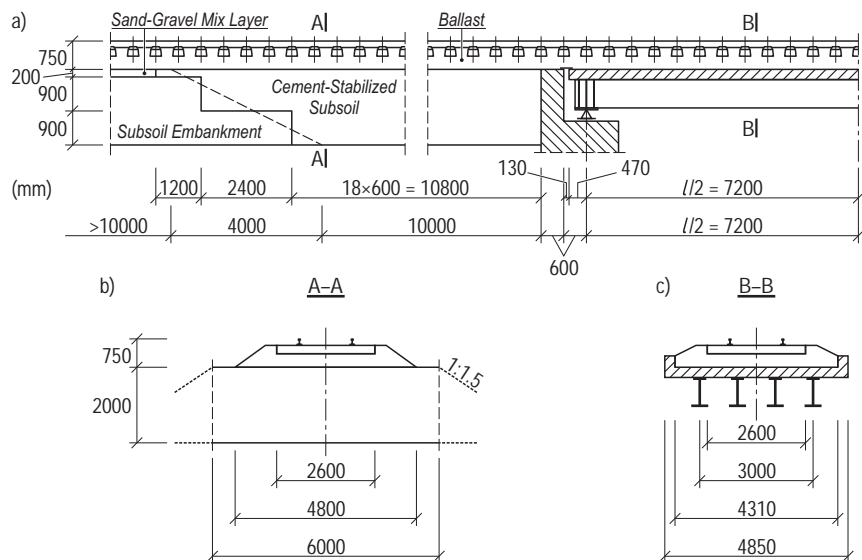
The ballasted track in the KNI 140070 bridge zone: the longitudinal section (a); the cross-section in the approach zone (b); the cross-section over the bridge span (c).
